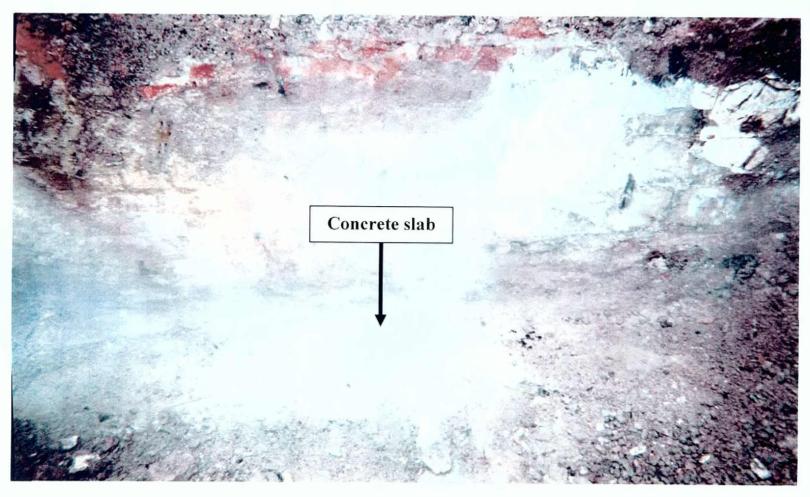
TP-5: Facing Northeast-Top view of wall dividing TP-5 (East) and TP-5 (West).
